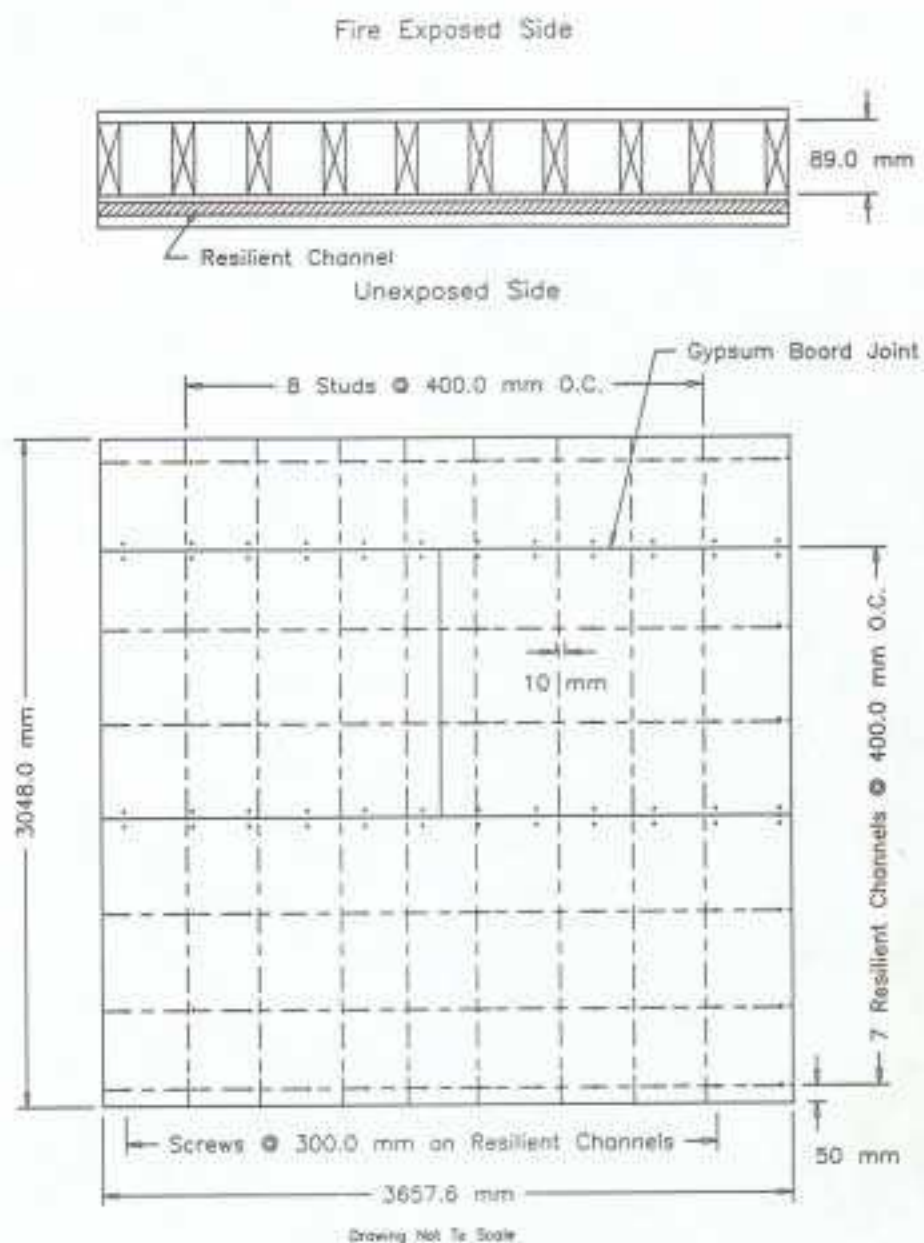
Screw Locations For Wood Stud, 1x2 Gypsum Board Layers, Full-Scale Assembly, Resilient Channel on Unexposed Side (Base Layer Unexposed Side)
